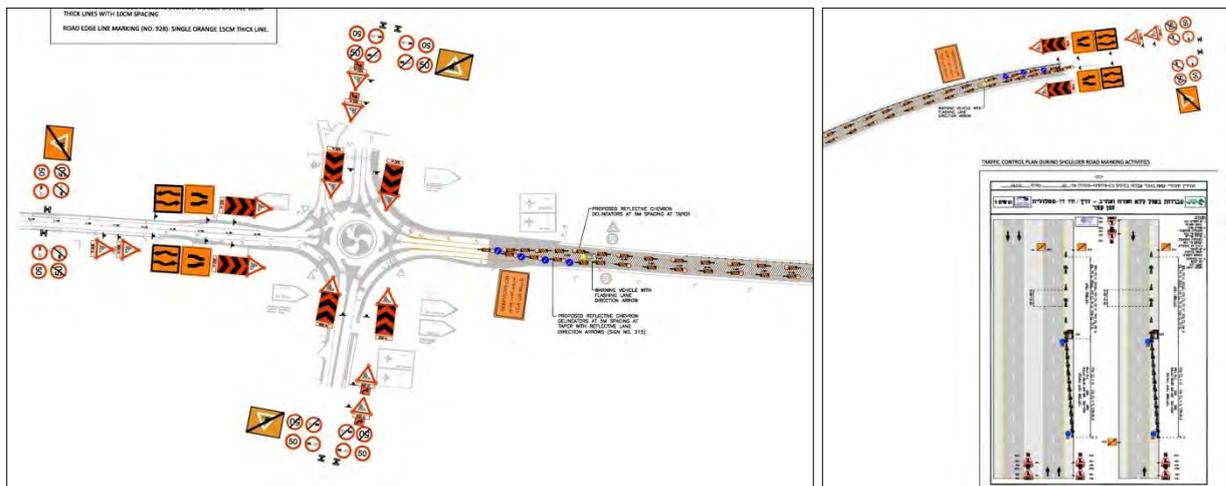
Project 04- WNV- Sample sheet of approved traffic control plan.
